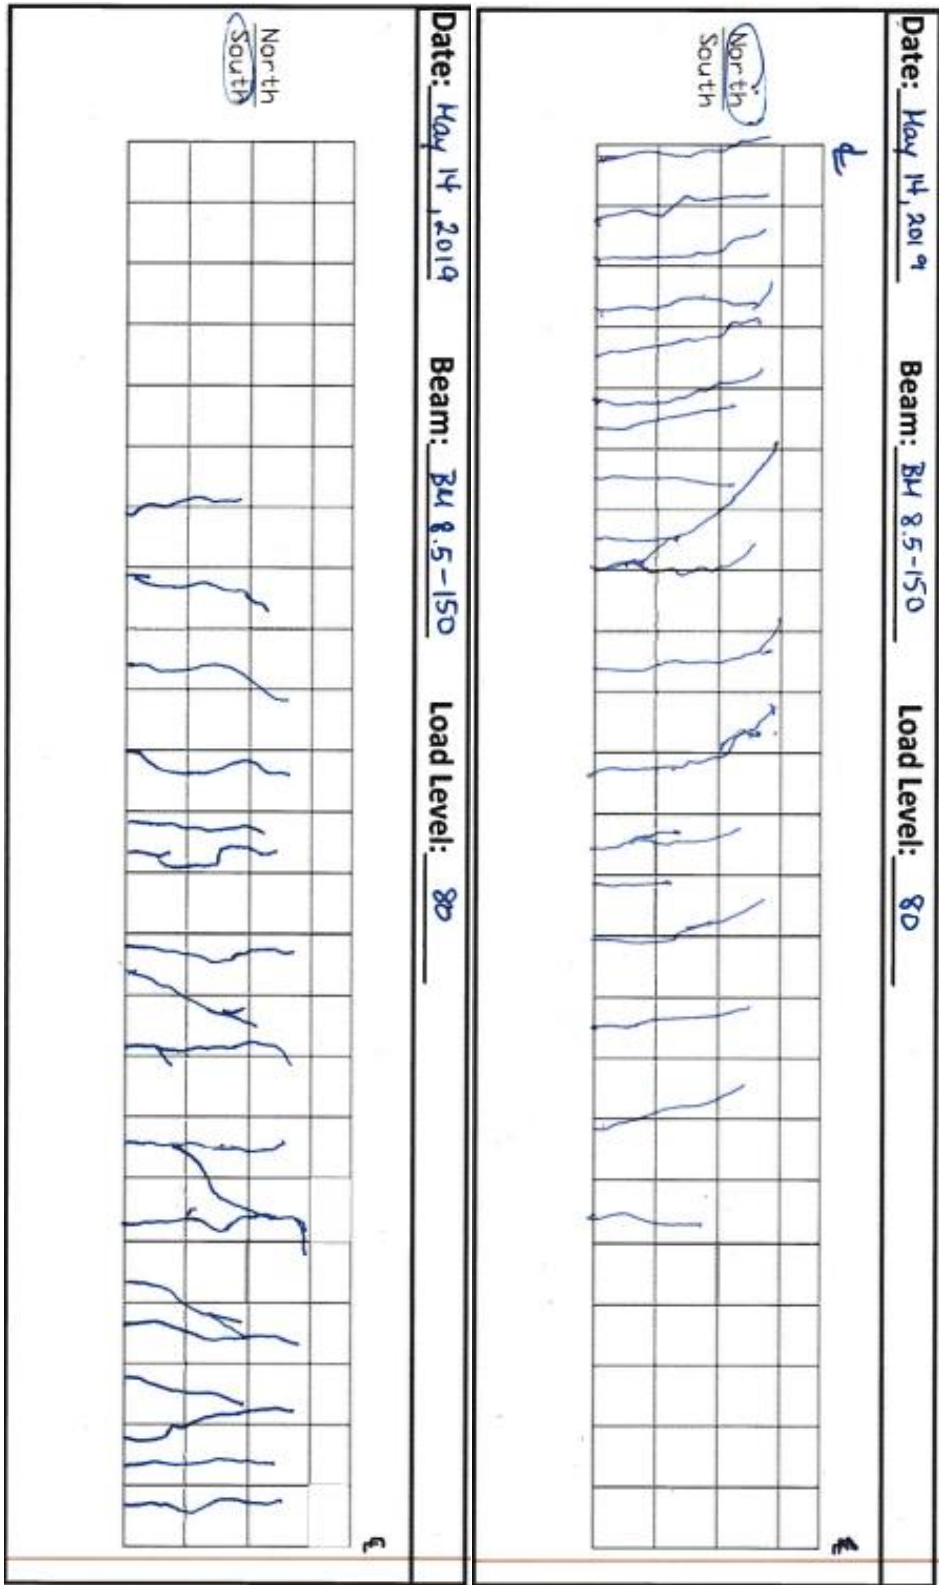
Crack tracking of BM 8.5-150 at 80 kN
